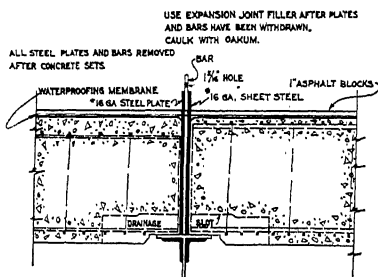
Expansion Joint Device—Encased I-Beam Floor.
